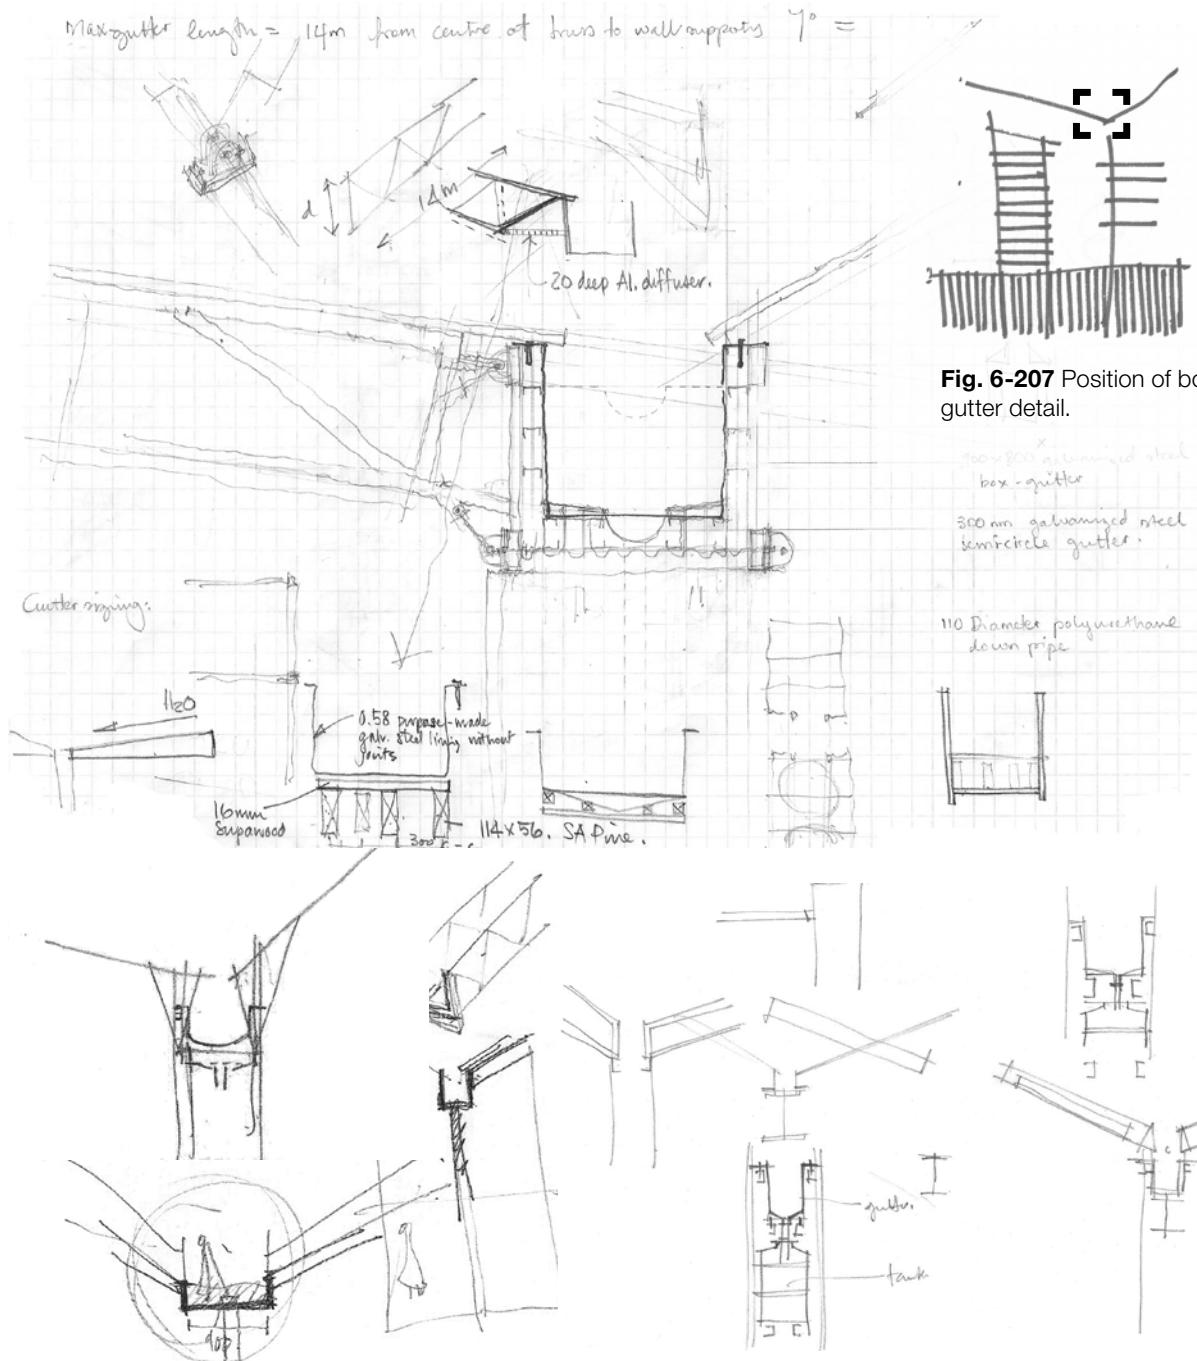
Box gutter detail design sketches. The box-gutter lining is made from 0.58 galvanised steel lining on a 16mm supawood base nailed to 114x76 SA pine timber sections.
